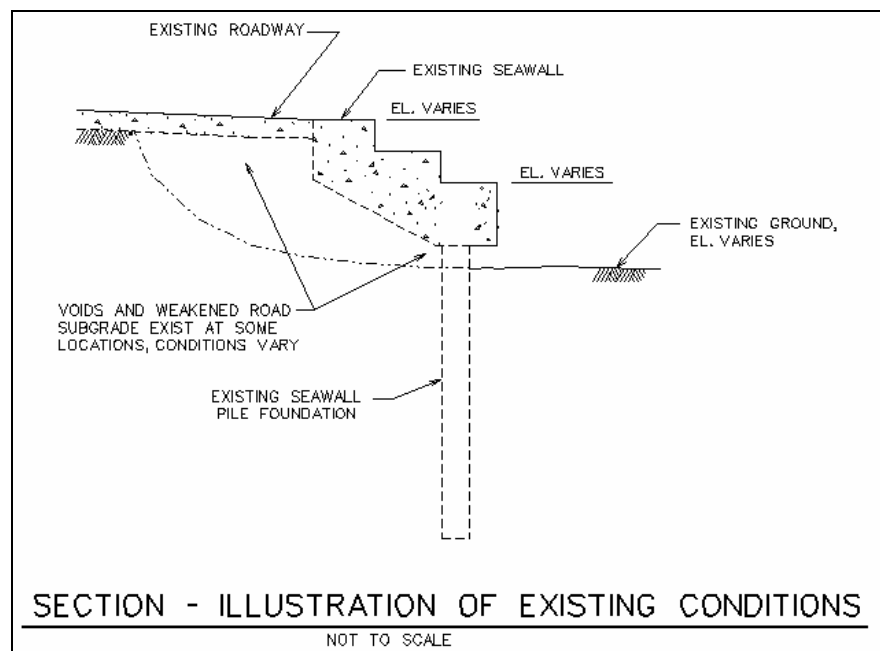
Cowand Point, Typical Section of Existing Seawall
